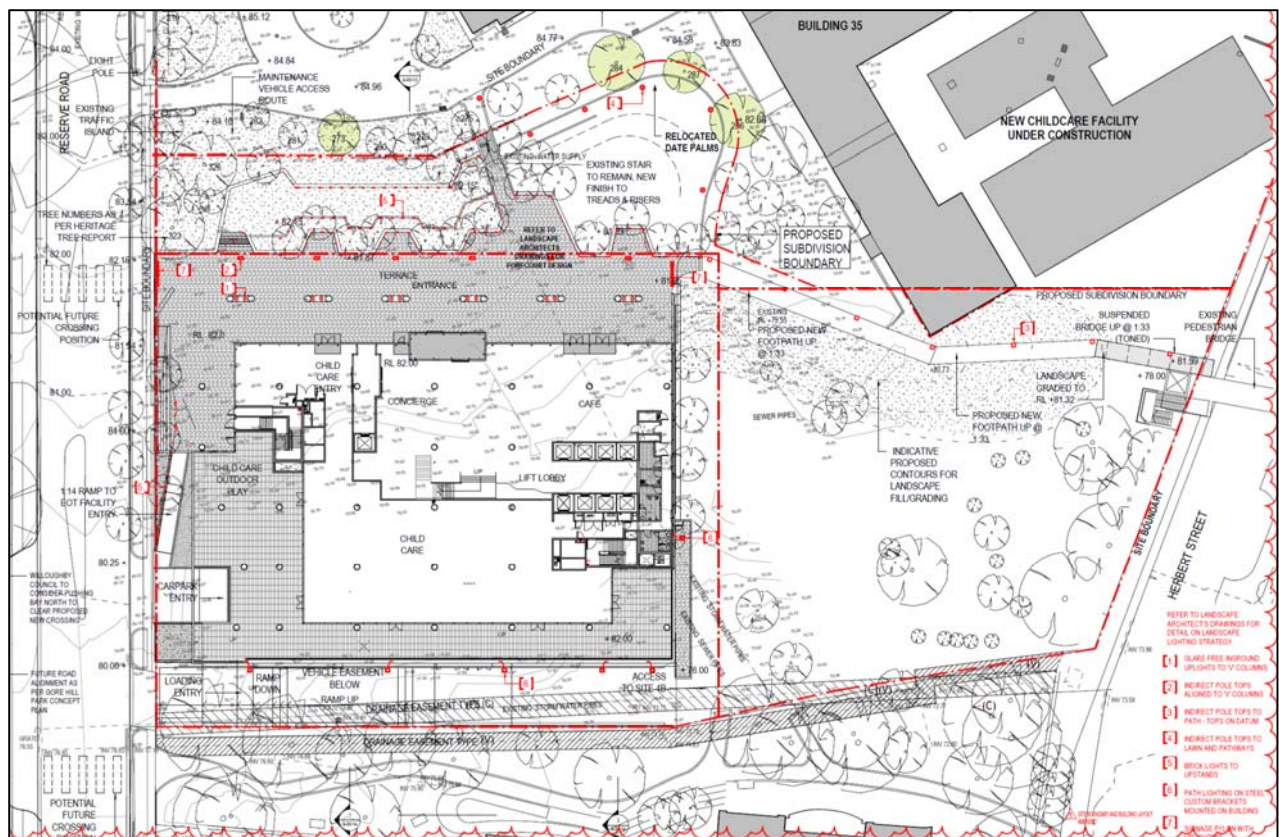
Proposed Site Plan (source: R/S – BVN Architects)
